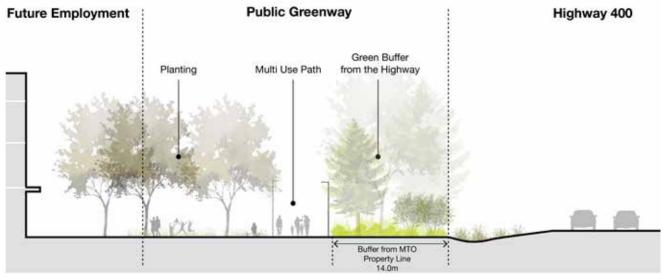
Indicative cross section of a Greenway adjacent to Highway 400 within the business district.
